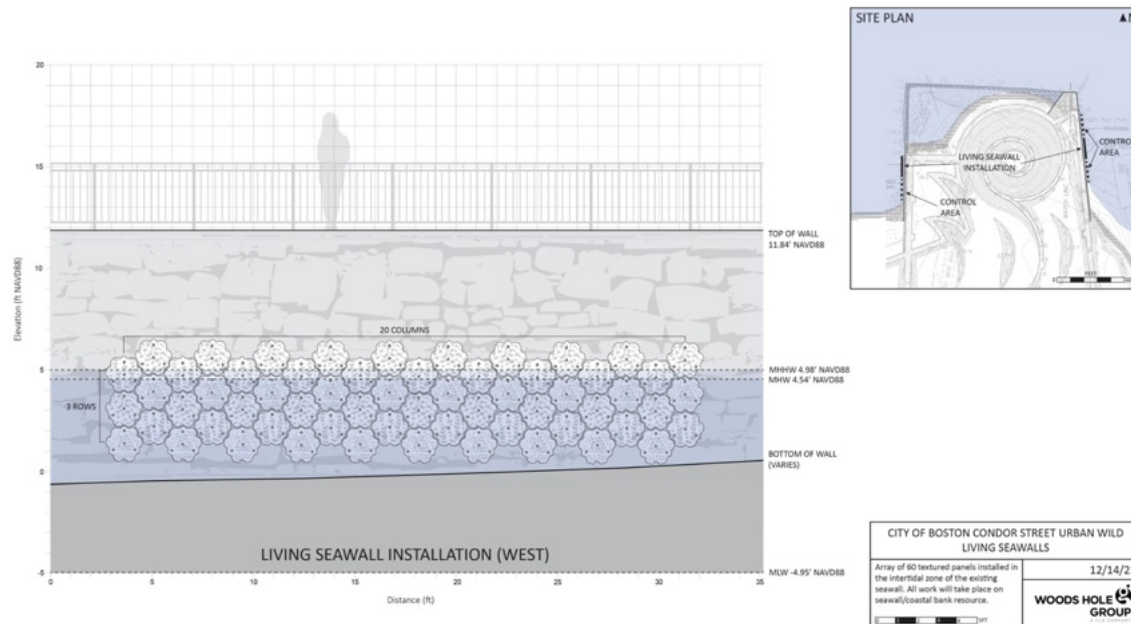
Engineering design plan for the west-facing Living Seawalls installation at Condor Street Urban Wild, East Boston.
